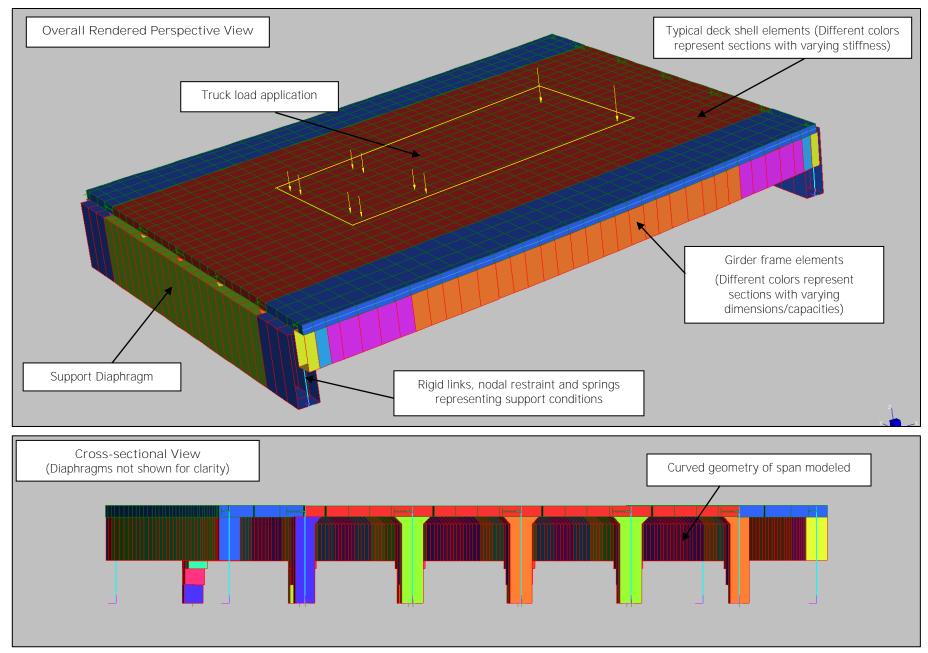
Model Overview of Washington Approach Span 23 FEM illustrating test truck on the bridge
